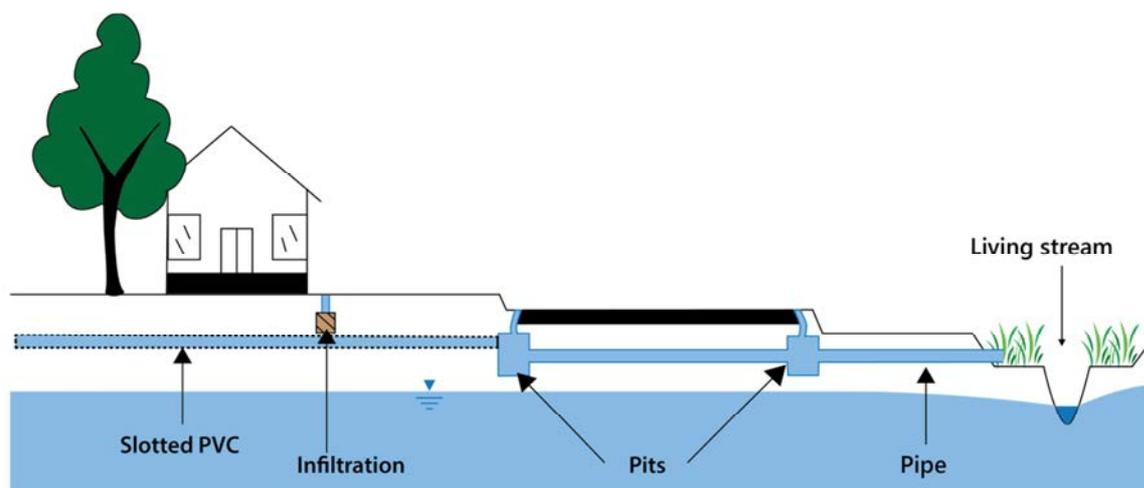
Conceptual model for the drainage Configuration 6: Subsoil drainage (urban residential) and piped drainage (road reserve)
